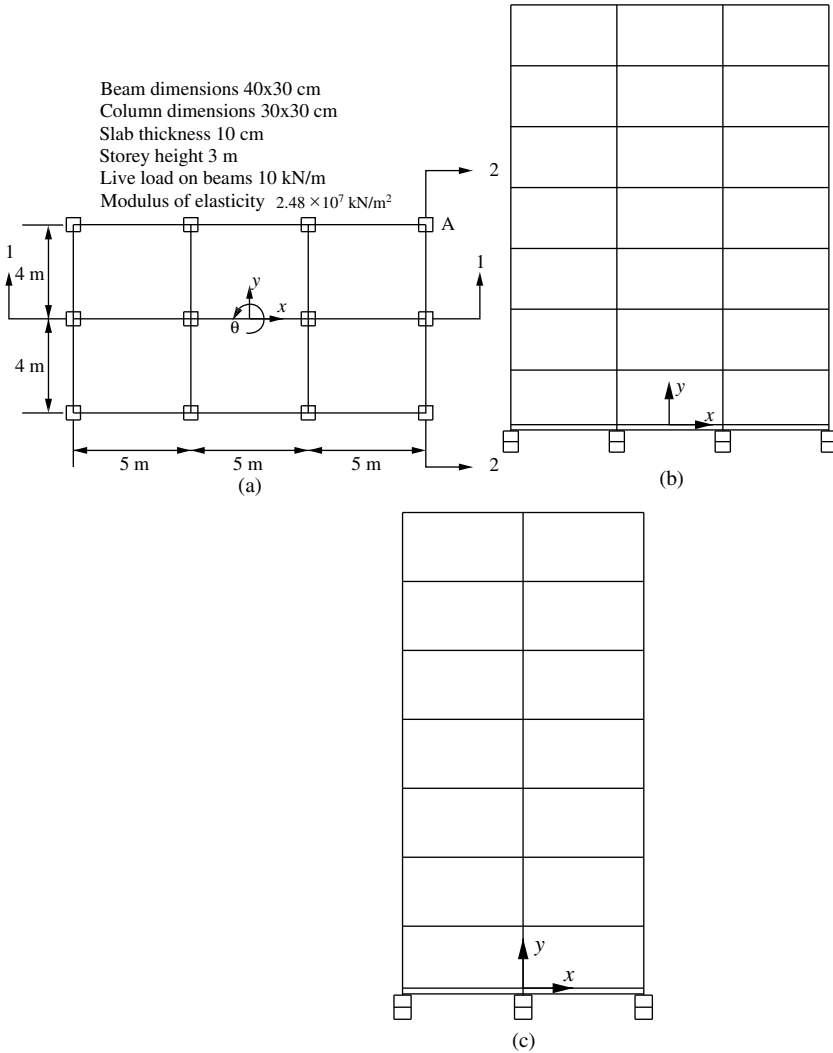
3D frame and its properties: (a) plan; (b) frame elevation 1-1; and (c) frame elevation 2-2
